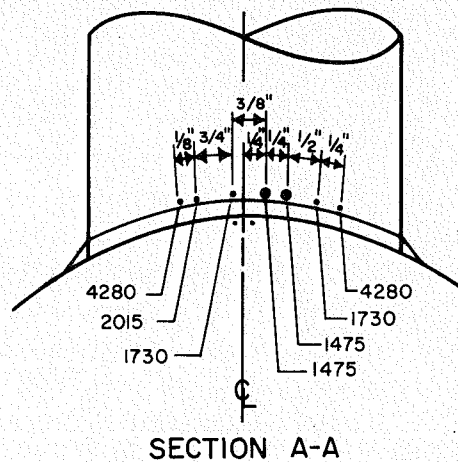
CRACK PROPAGATION IN TYPE I JOINT (THIN WALL CEMENT-GROUT FILLED) LOADED AT $\pm 50k$ IN HORIZONTAL MEMBER
